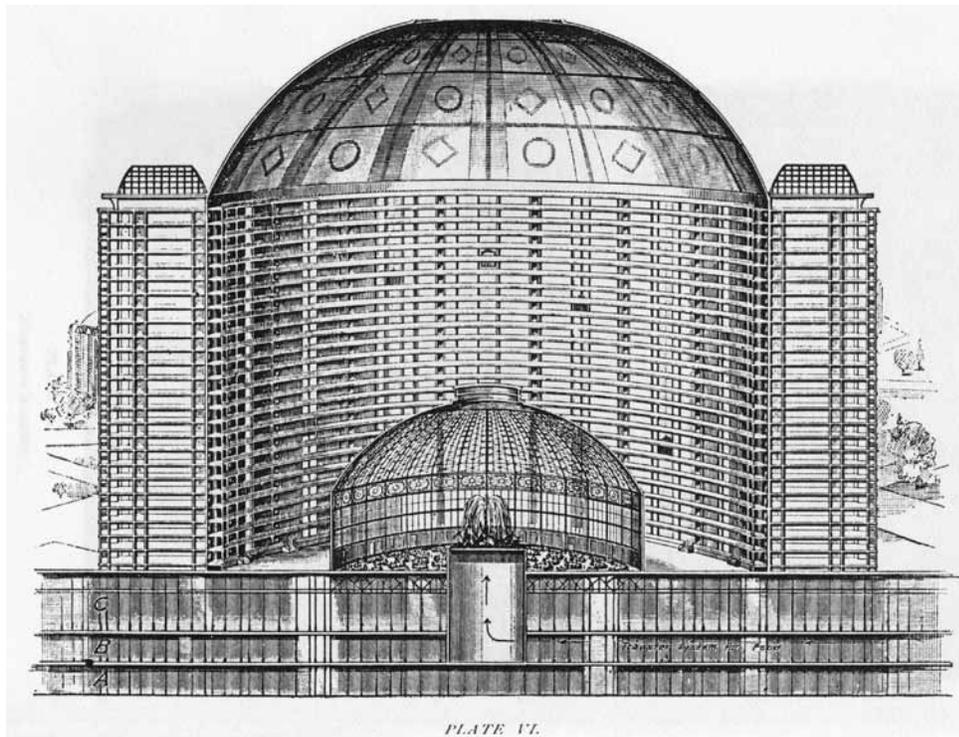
Section of one of Metropolis' residential beehive towers, featuring apartment stacks, an inner skylit atrium courtyard, and a glass-covered communal dining hall with fountain. Also shown are the stratified layers of the urban platform that makes up the base of Metropolis — each level is reserved for, in descending order, C) pedestrian transport; B) mechanized transport; and A) sewage, water, hot and cold air, and electrical systems. From K.C. Gillette, *The Human Drift*, 1894.
